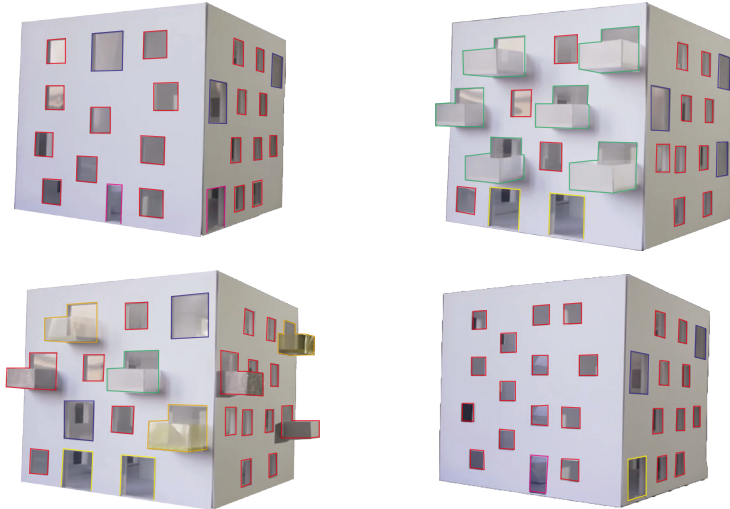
Variable and flexible facade which has multiple variants using different elements. Drawing by Author. The Bremer Punkt uses a variety of facade elements to construct a playful facade. The facade openings that we can see in the built Bremer Punkt are elements from the surrounding buildings. They integrated the cube by using these elements but still kept a unique and modernistic expression by avoiding simple repetition in their facade. They also used the same materialistic expression to integrate it with the surrounding buildings. But it also is a possible solution to a changing society which has its own living or production needs. In the diagram below we can see this concept and how it could change over time. This flexibility is one of the major benefits on not only an architectural level but also on an urban level.
